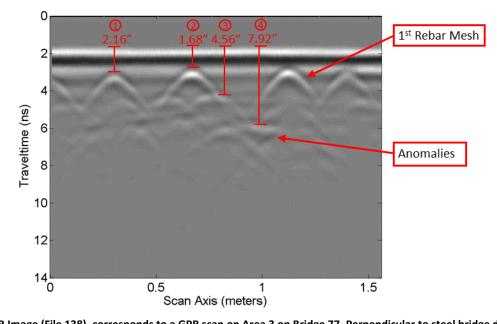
GPR Image (File 138), corresponds to a GPR scan on Area 3 on Bridge 77. Perpendicular to steel bridge deck girder.
